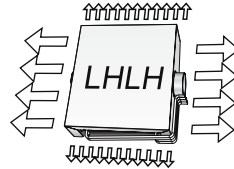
Nozzle setting example, ADAPT Parasol EX single-module unit - LHLH.
